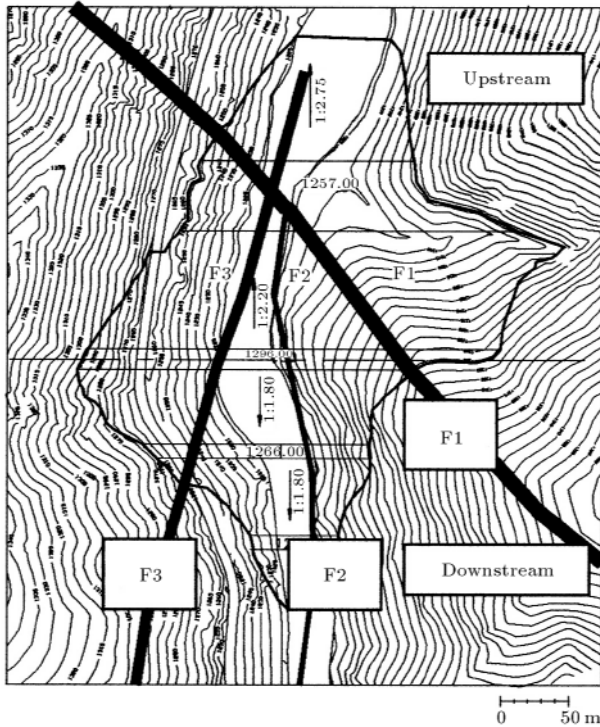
Site plane of the rock-fill dam and crossing faults (F1, F2 and F3).
